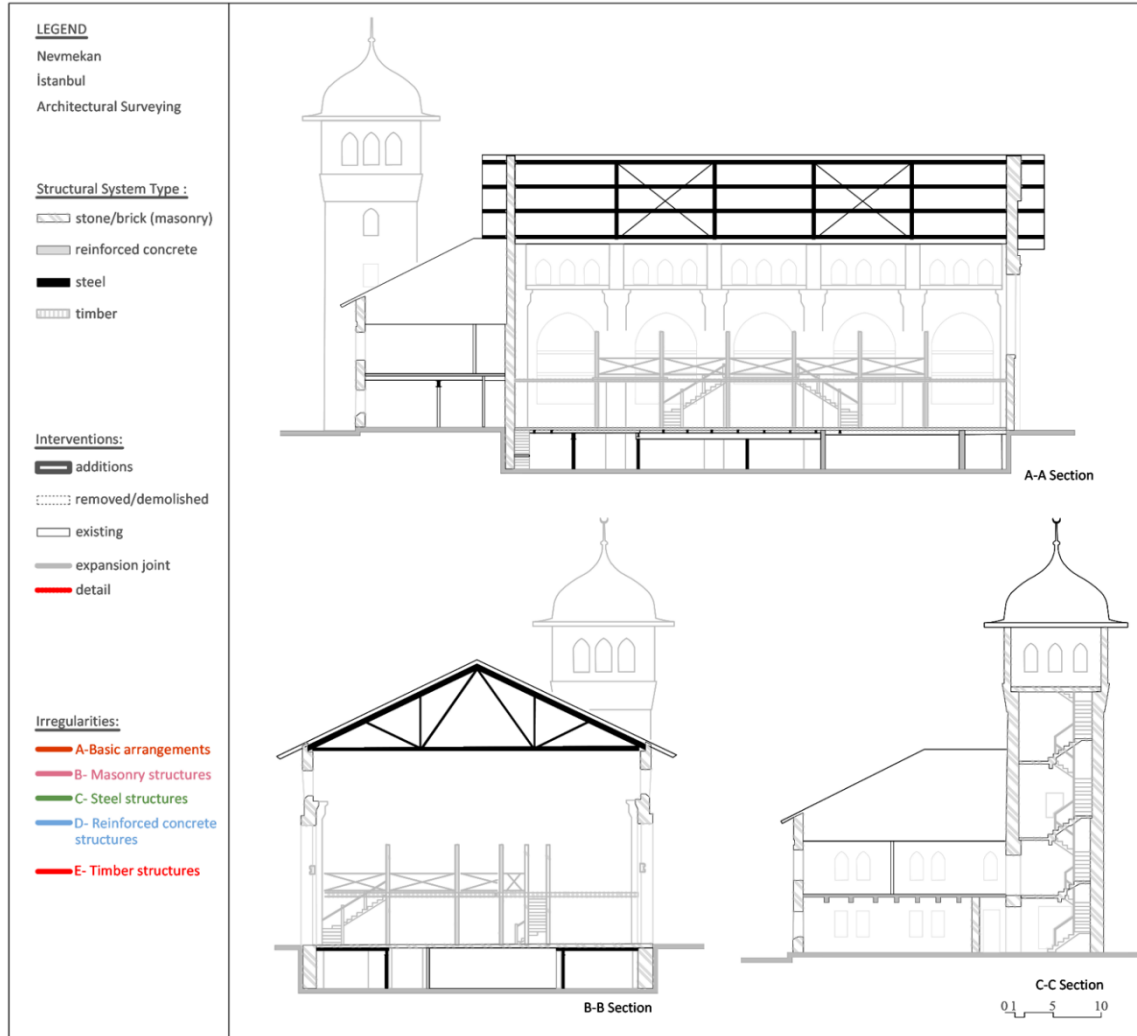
Nevmekean restoration project sections (Adapted from Köroğlu, 2019)
